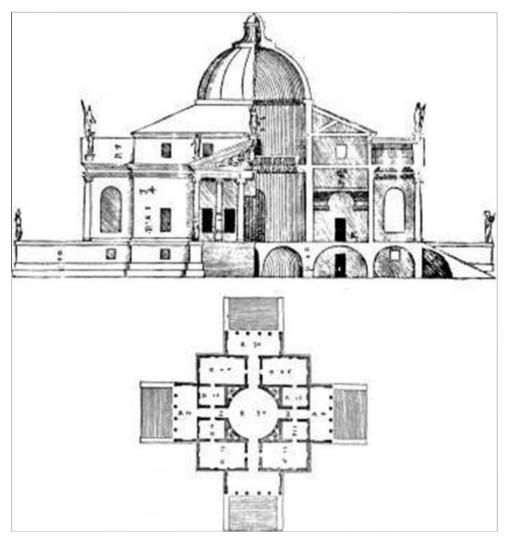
A floor Plan diagram of the Villa La Rotonda.
